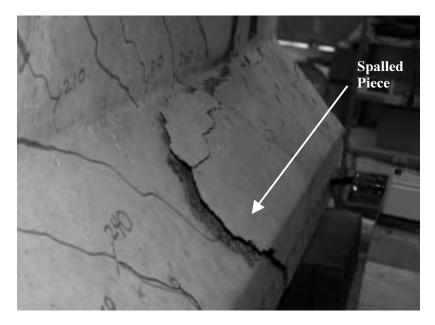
Support Spalling (LW8000-2-N-70)
